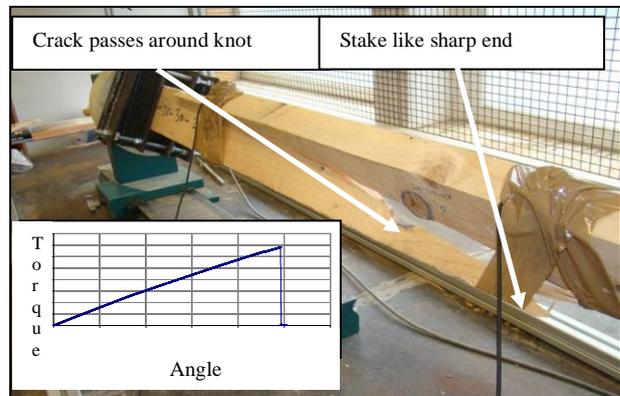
A combined shear tension failure occurred in 2.8m joist and crack passed through knot and ends up with a sharp end
